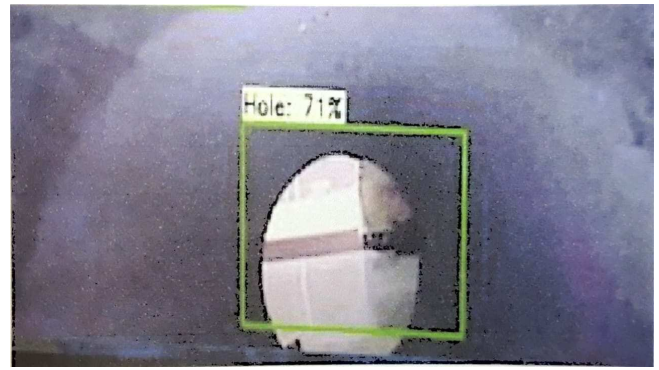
Hole identification by Inspection Robot highlighted using the green box.
